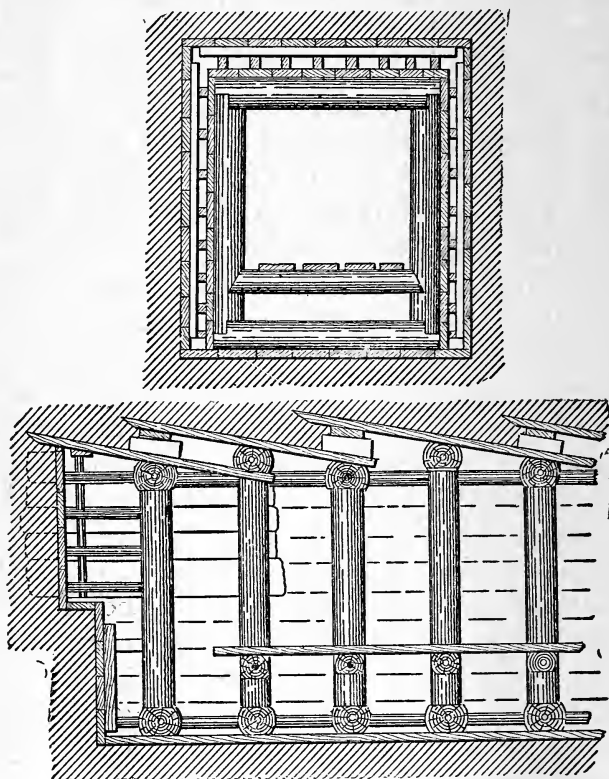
TIMBERING FOR TUNNEL HEADING.
